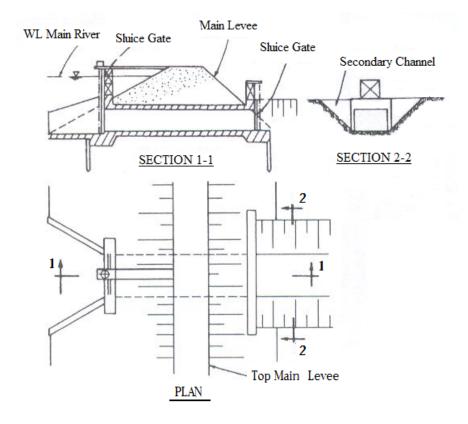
Culvert outlet through levee with sluice gates. (Source: Przedwojski, 1995)
